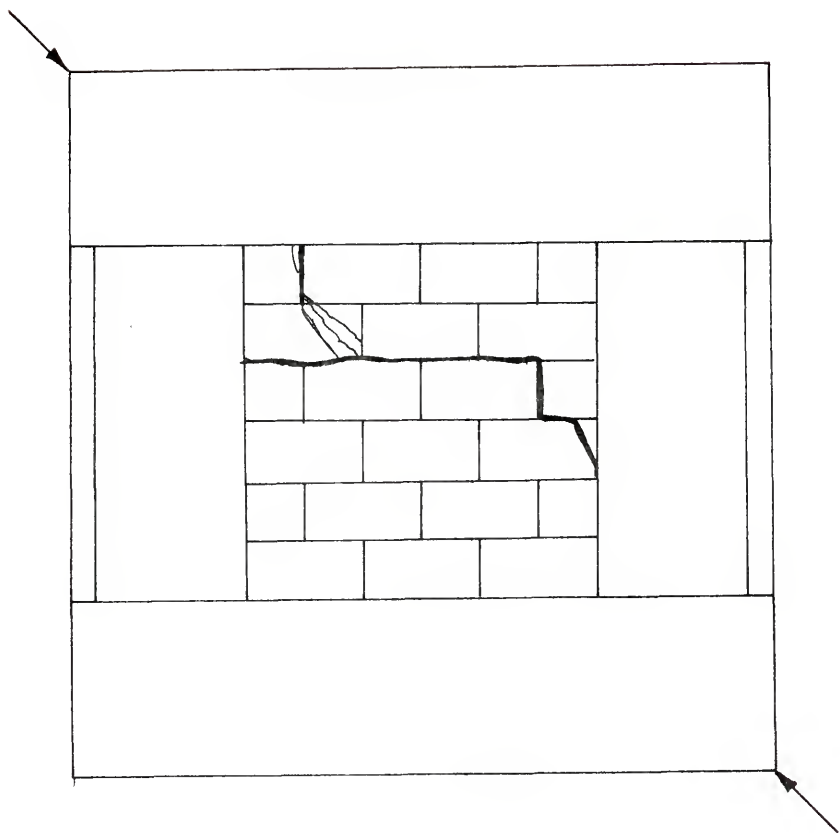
Failure pattern of hollow pier PR 1
